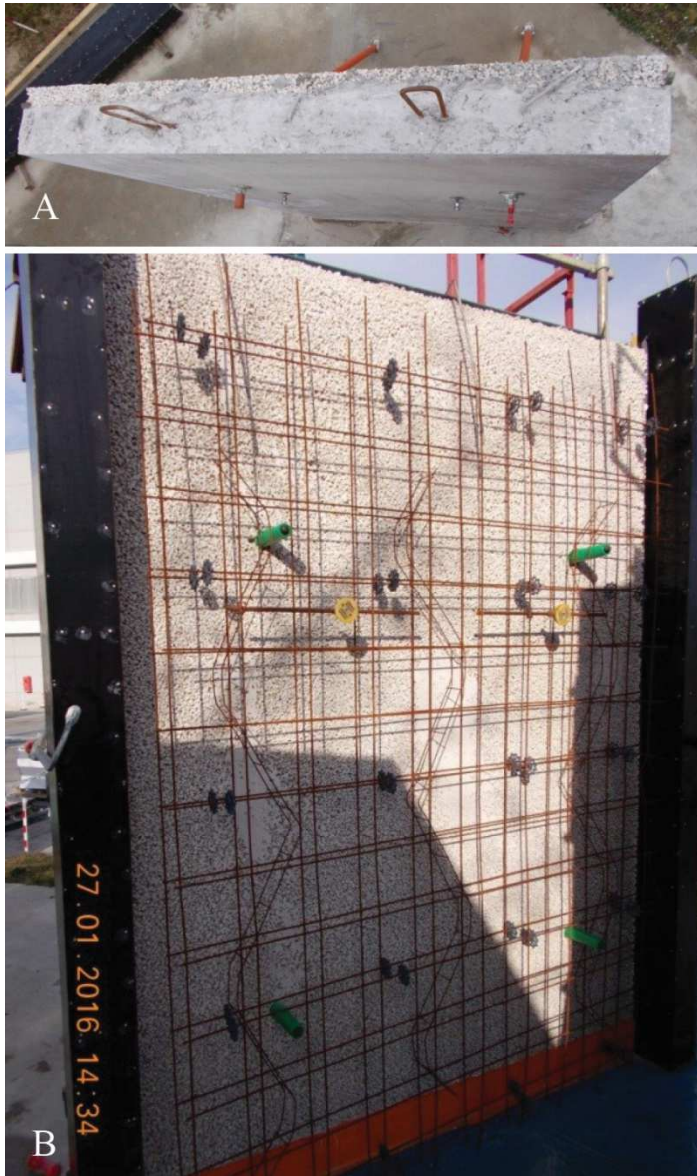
A: View of concrete living wall from above. The pervious layer is toward the top of the image. B: Steel reinforcement in place for the normal concrete (the structural layer) and ready for the formwork to be closed.
